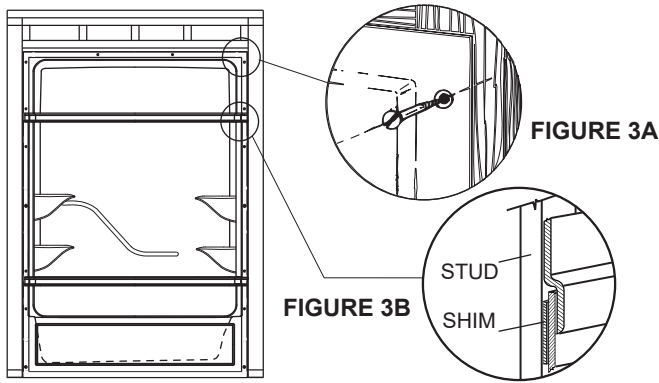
FASTENING WITH DRYWALL SCREWS
